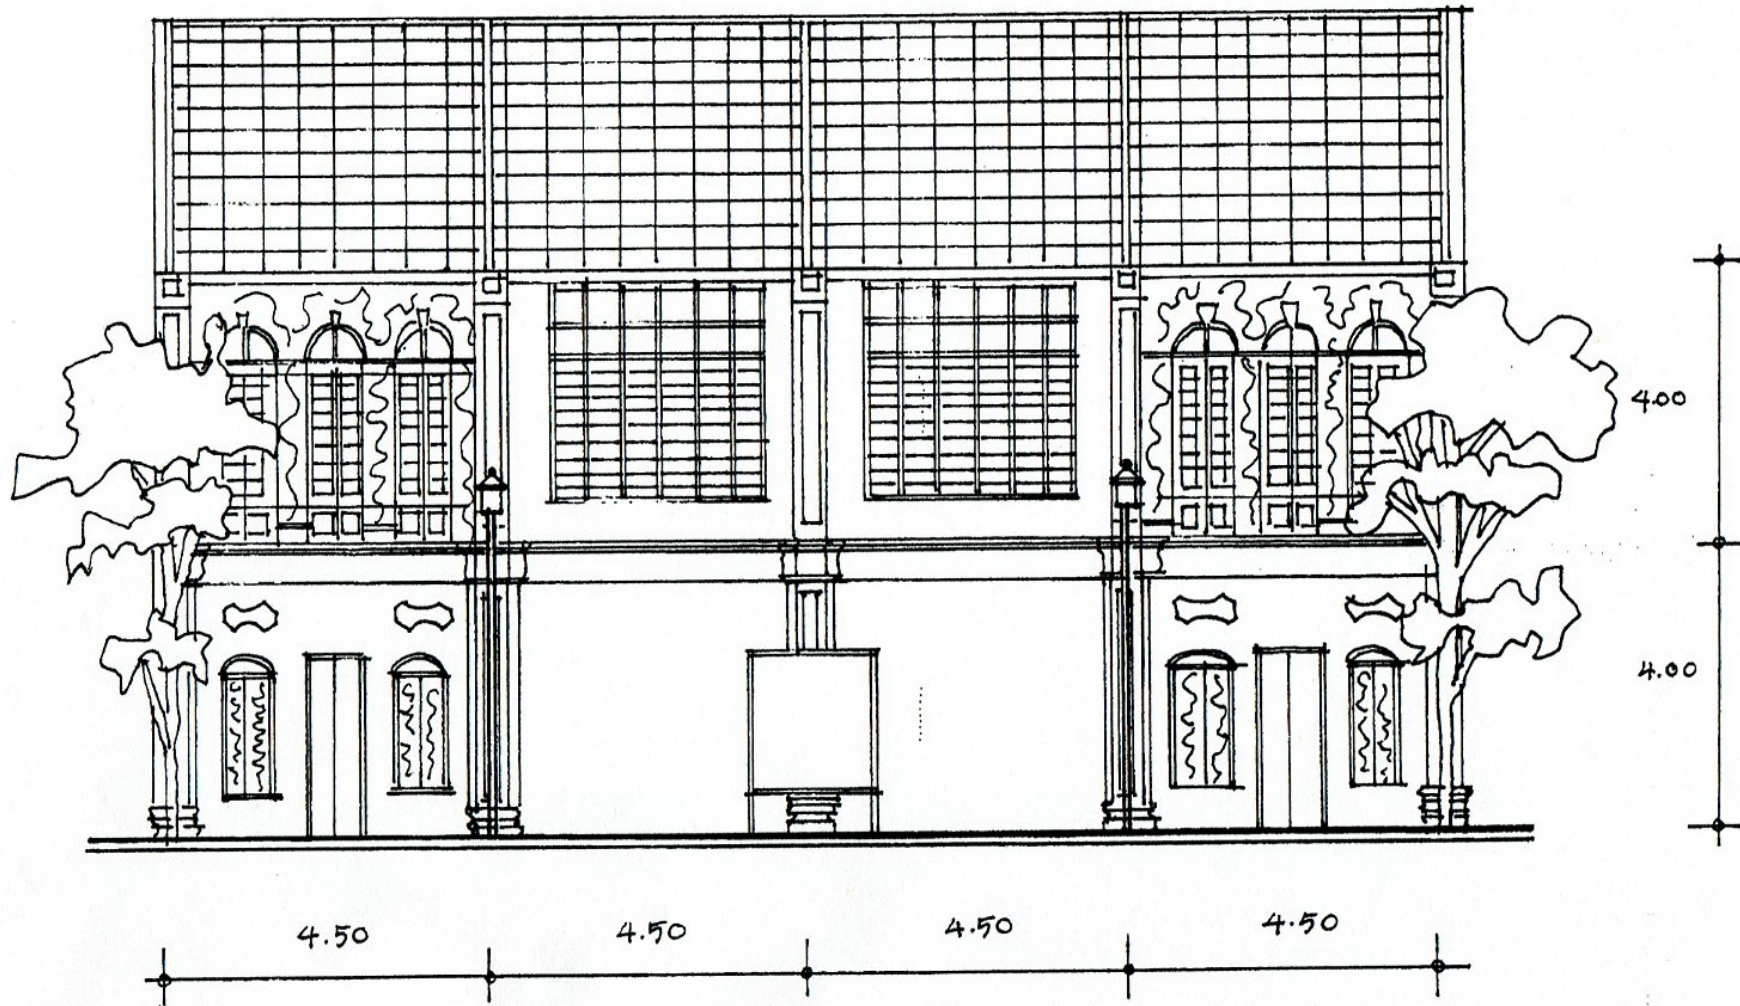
Elevation of streetscape upgrades on Krabi road, Yaowarat road, Phang Nga road and Dibuk road in Phuket
